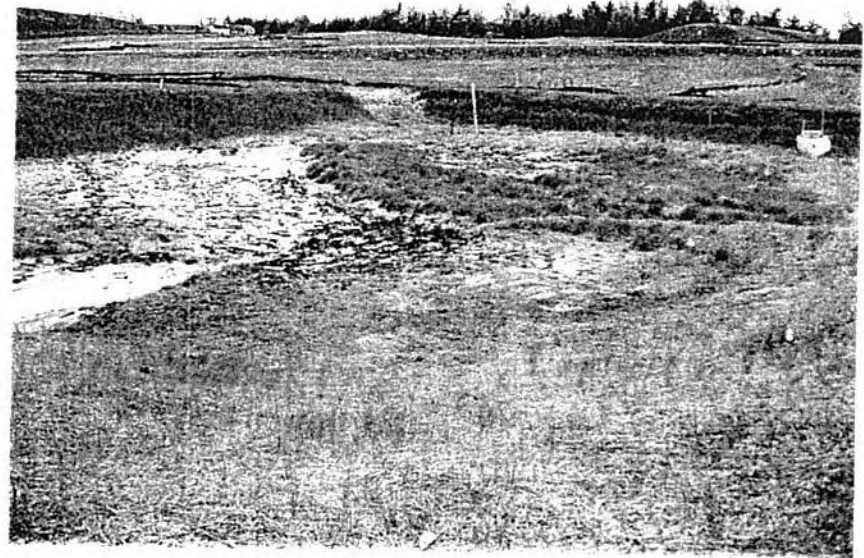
Area of constructed silt trap (photo # 15) showing the overflow spill way toward the north.
